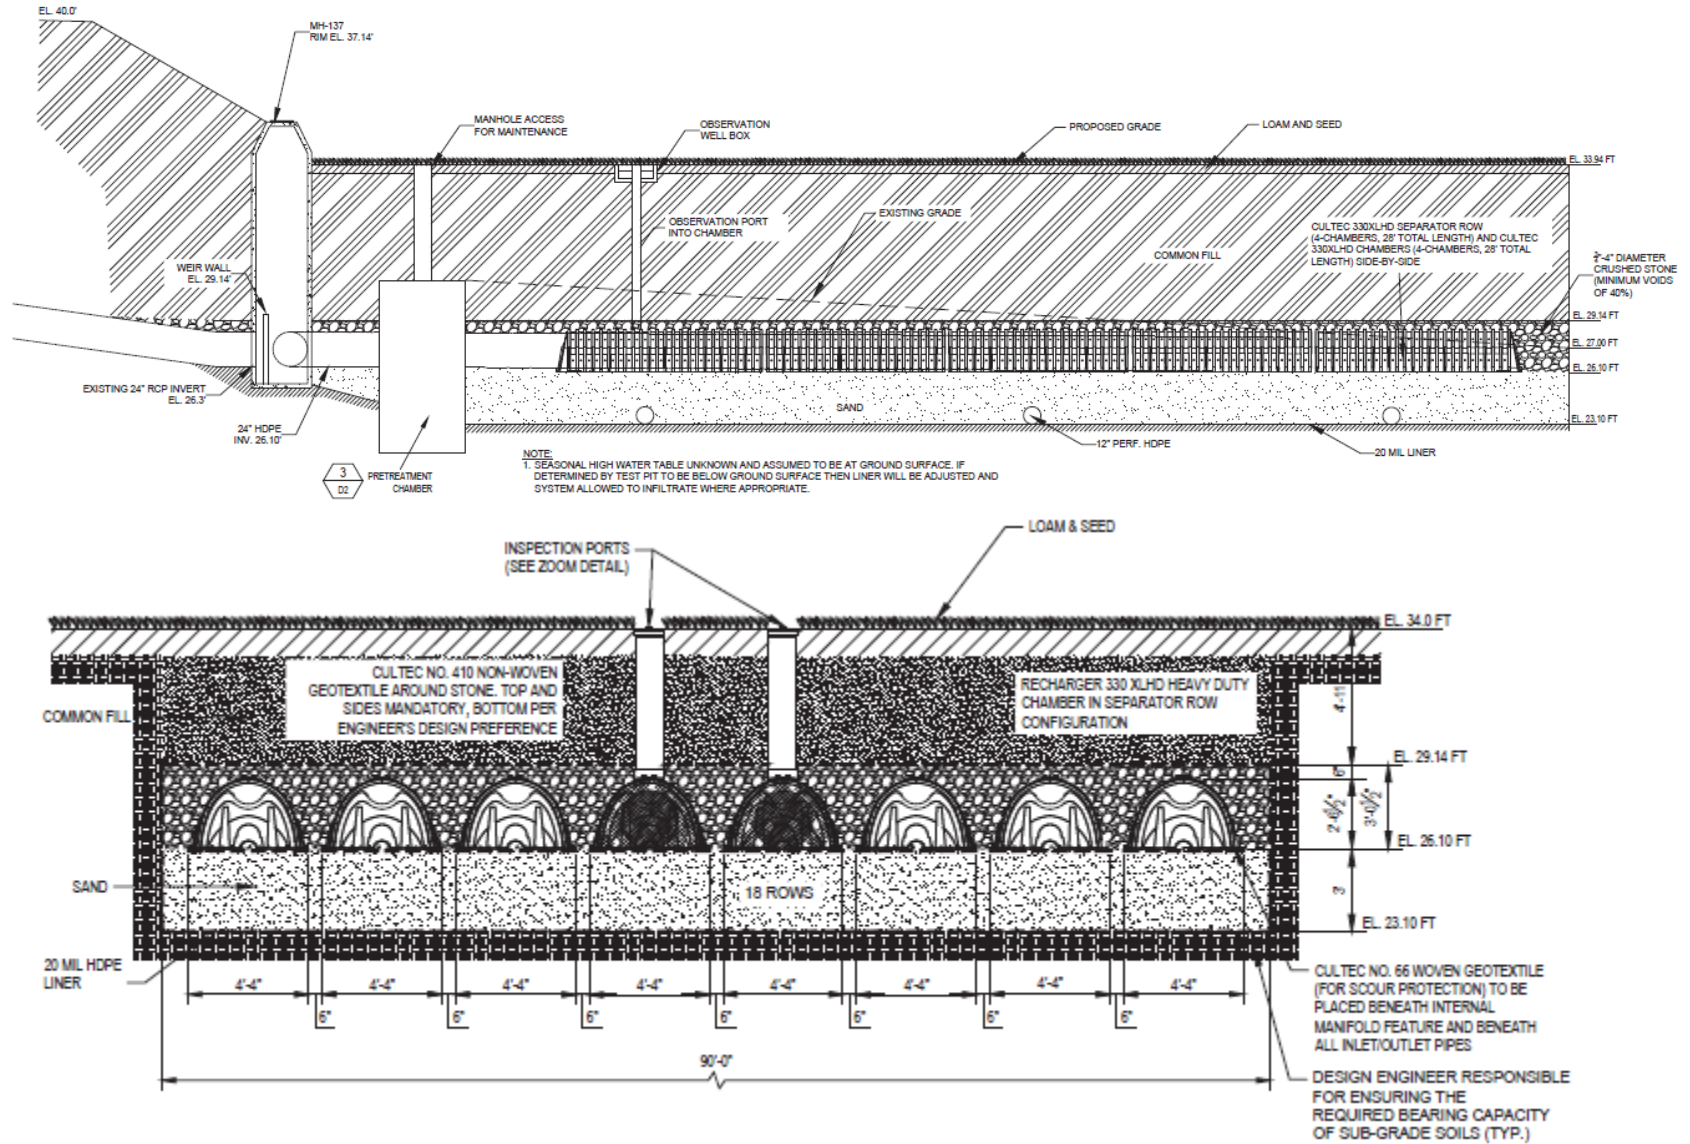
Engineering Section Details for Subsurface Infiltration BMP 4
